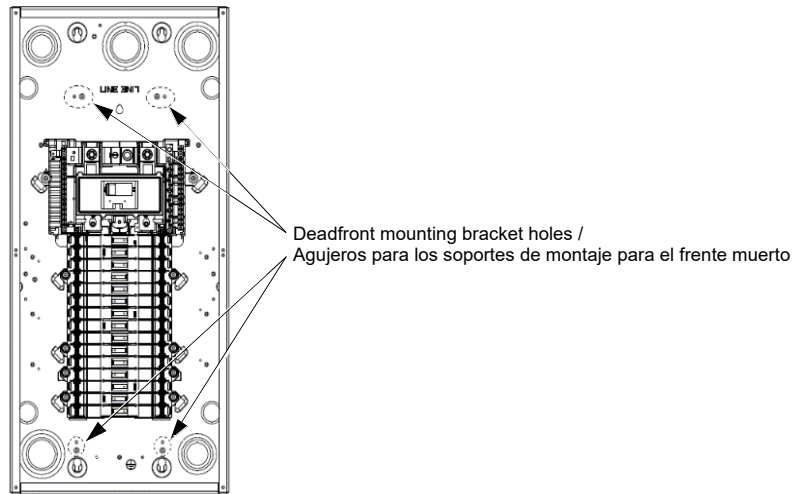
Deadfront Mounting Bracket Installation / Instalación del soporte de montaje para el frente muerto
